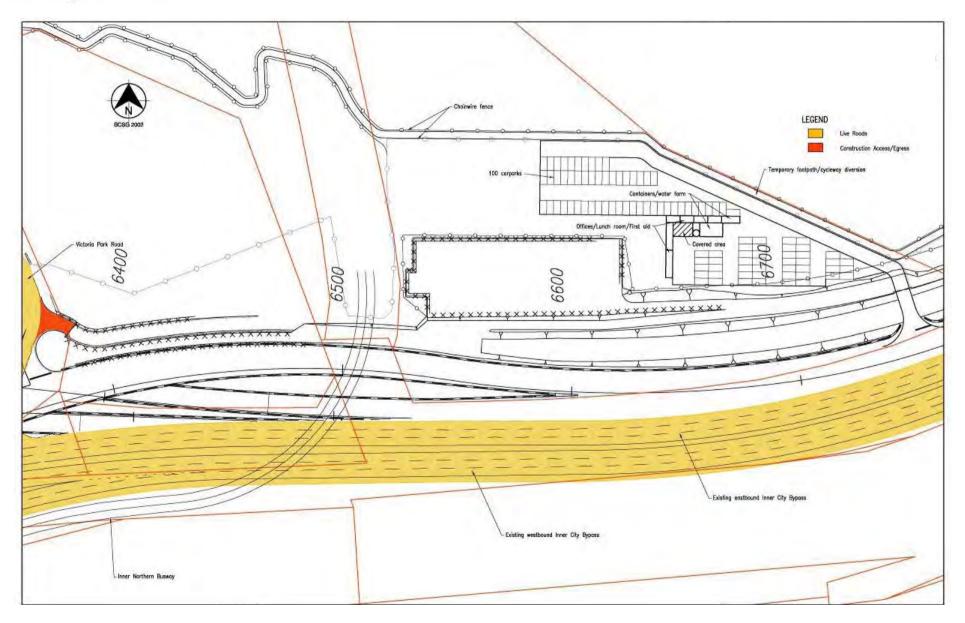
Eastern worksite – Stage 1, 2 & 3 layout
